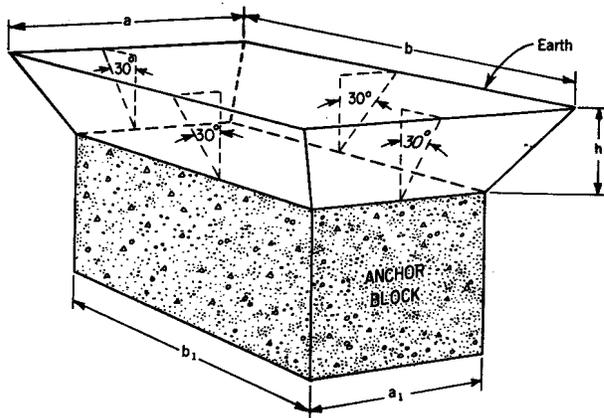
Assumed Shape of Earth Engaged by Anchor Block
